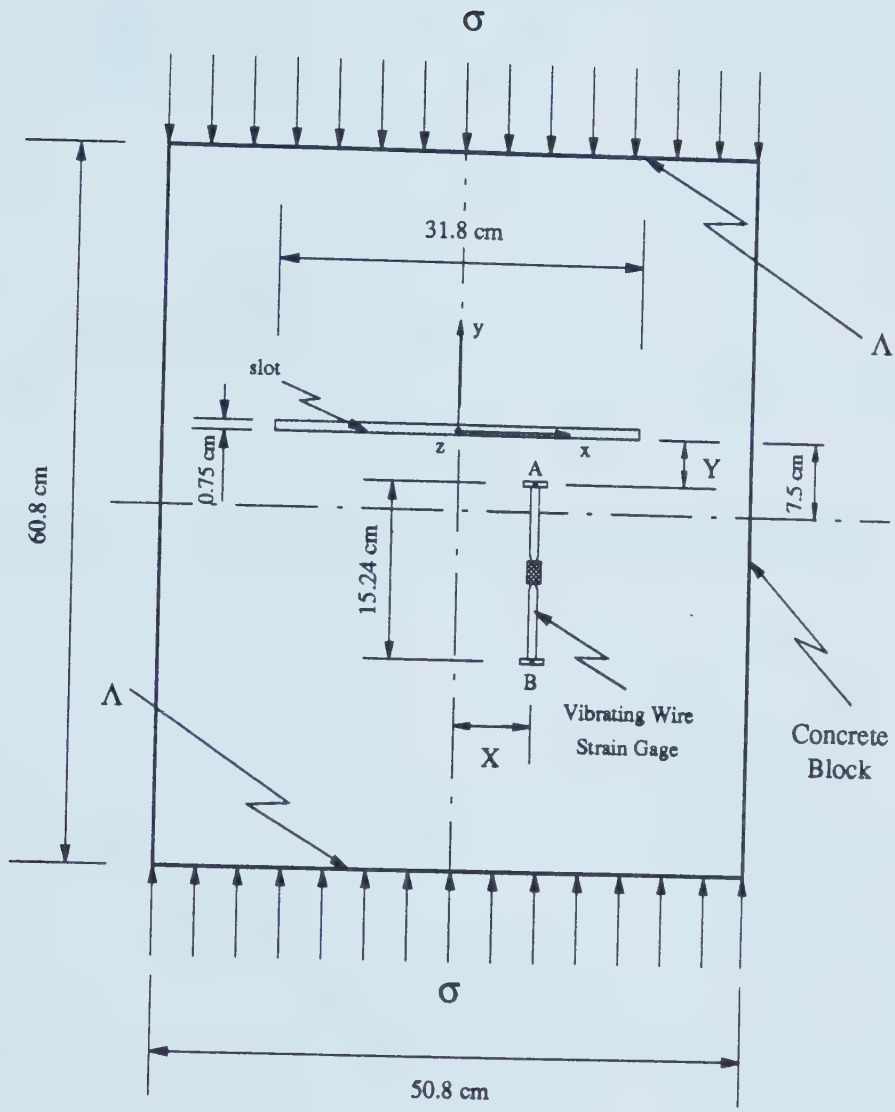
Layout of Laboratory Mini Flat Jack Test
